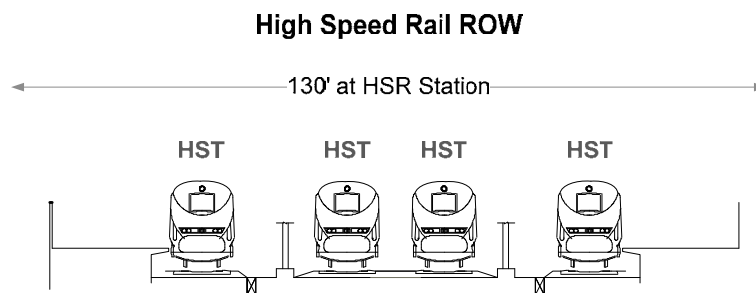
Proposed Layout of the Palmdale Station Option 1
